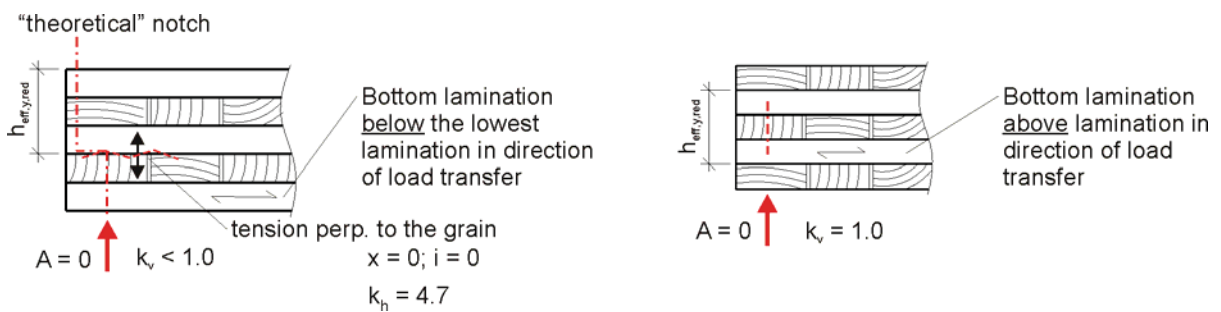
Left – partly supported edge – edge perpendicular to the cover layers
